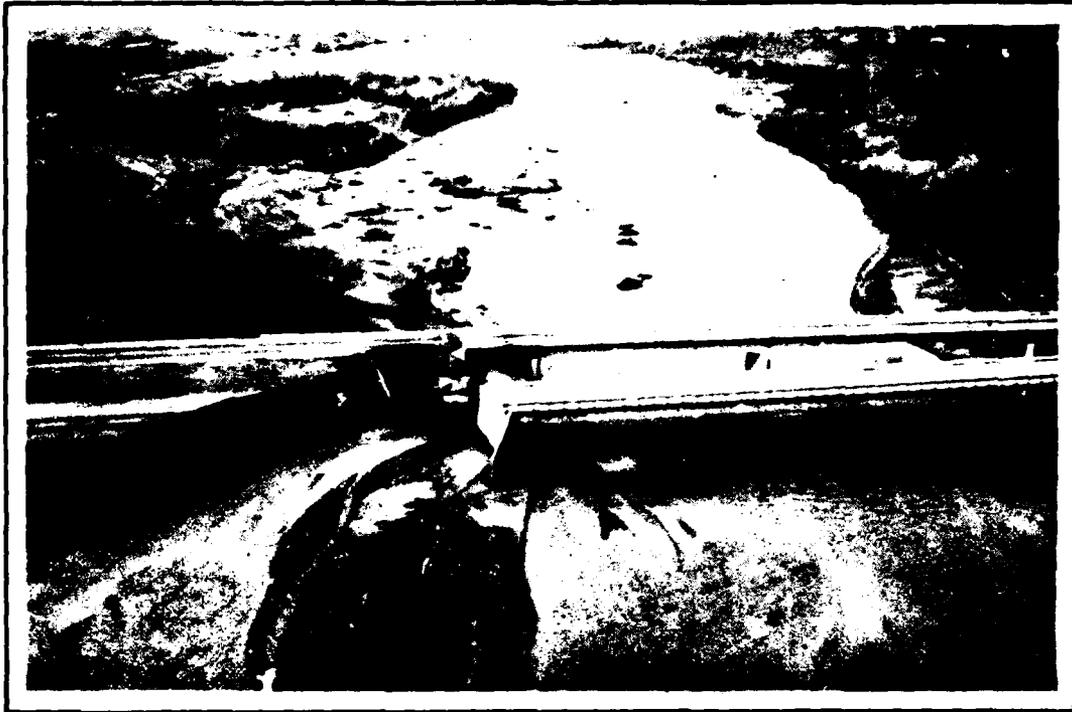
Washout of Van Buren Boulevard Bridge over the Santa Ana River during the 1969 Flood.
